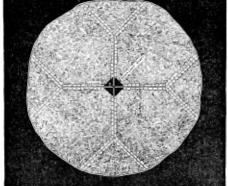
Plan of mine operated by Longwall method in strong and flexible roof,
